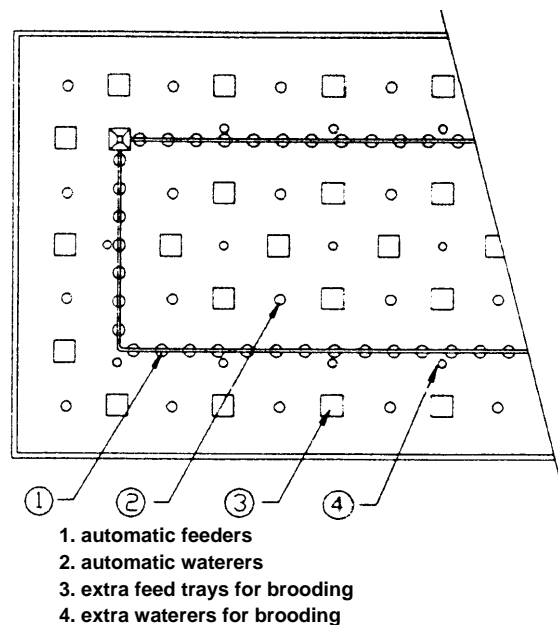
TYPICAL FEED AND WATER LAYOUT
